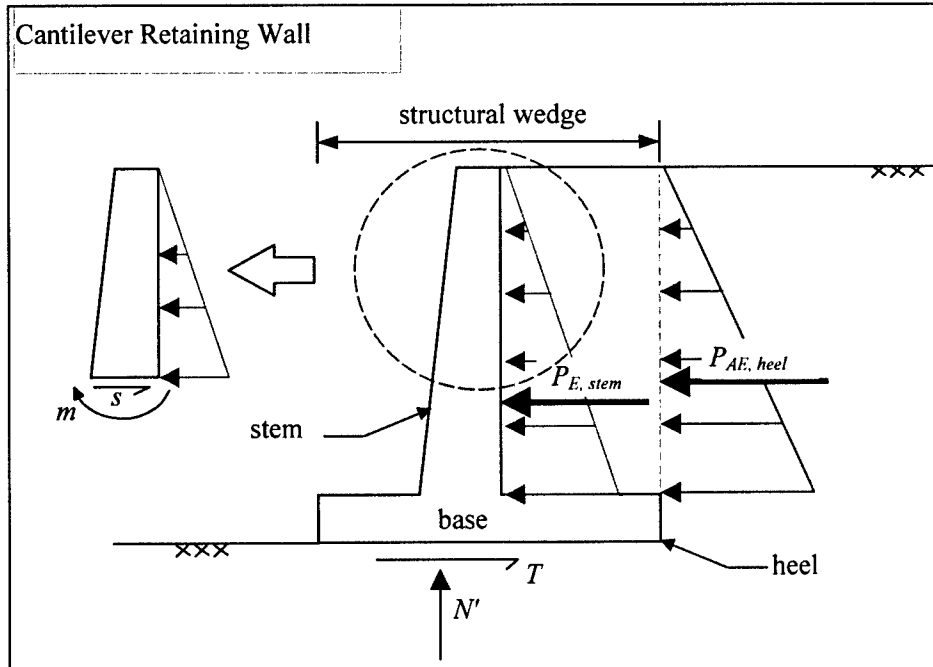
Loads acting on the structural wedge of a cantilever retaining wall
